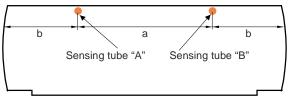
Tunnels with flat ceiling, over 3 traffic lanes
